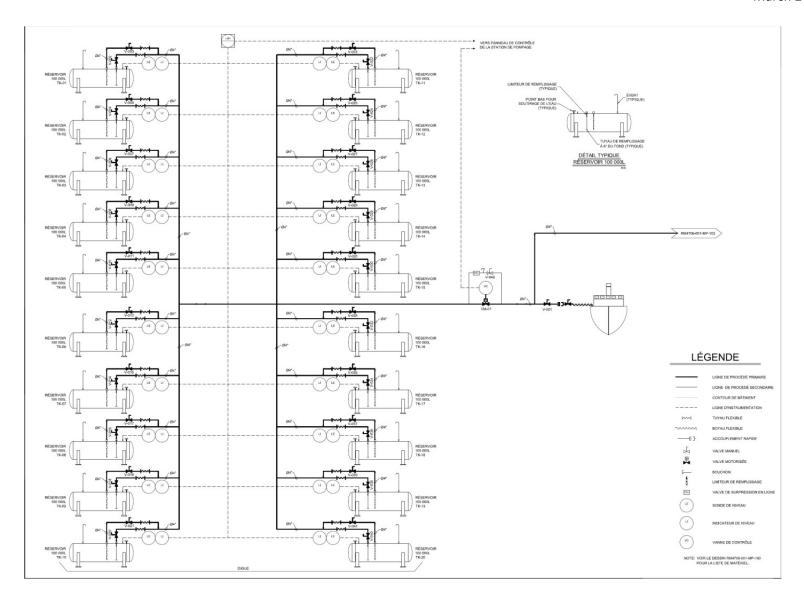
Baker Lake Marshalling Area Layout: Jet-A Fuel Storage Facility
